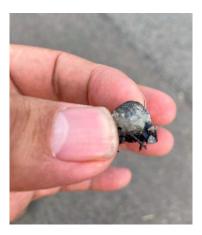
Photo. Chip Pulled Out from the Core Surface.
